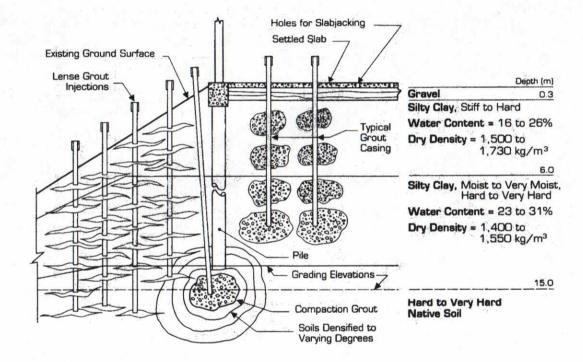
Cross-Section through Building Foundation and Slope Area (for Location See Fig. 1)
